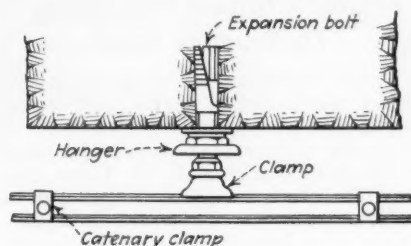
Tangent Catenary Using Old Trolley Wire as Both Feeder and Messenger
